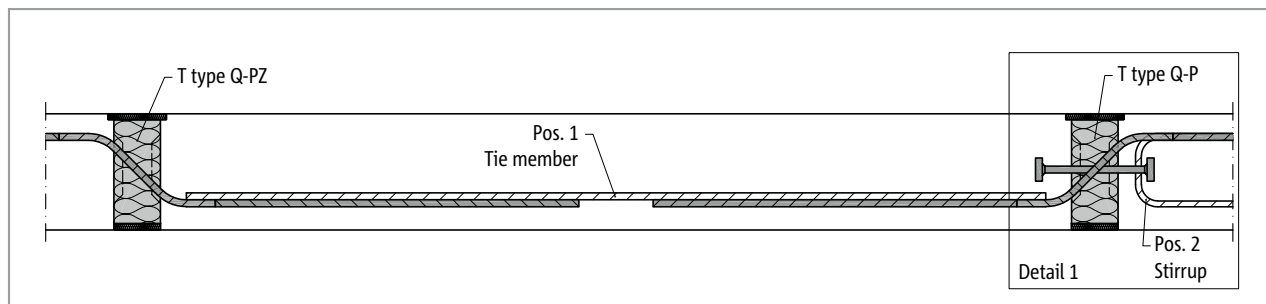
Schöck Isokorb® T type Q-PZ, Q-P: Section A-A; Tie member connection
